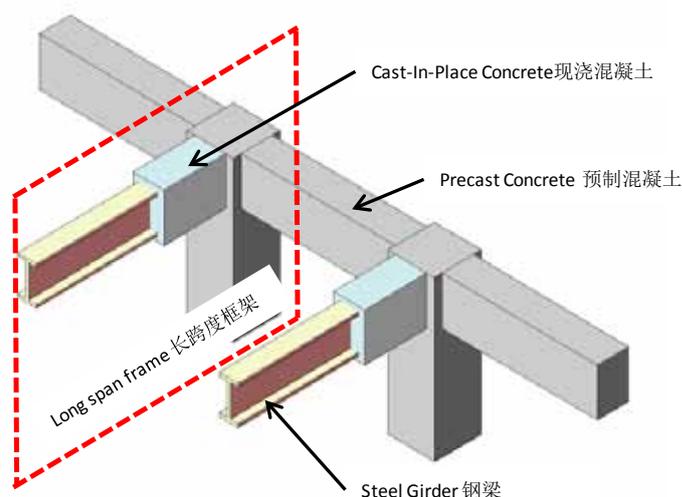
Configuration of a portion scramble steel Girder-Reinforced Concrete (Source:Obayashi Corporation)
